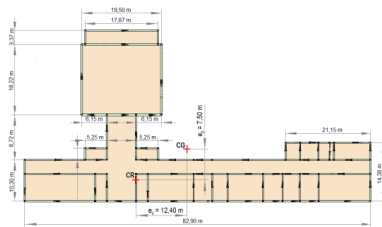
General plan of Horticulture Faculty (wings B1 and B2 with no expansion joint)
